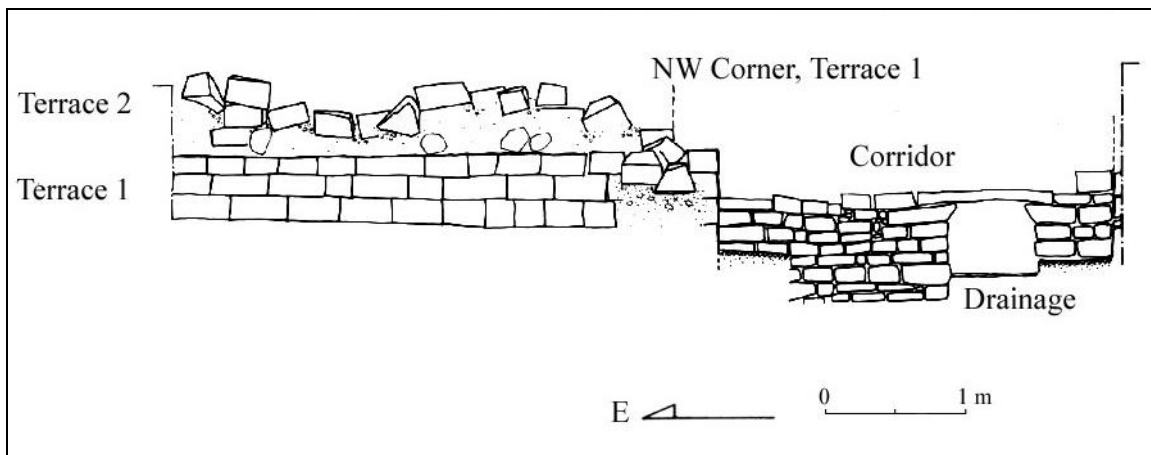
Detail of North profile, NW Corner of Structure L7-26 (Drawing by R. Cambranes, VCAP)
